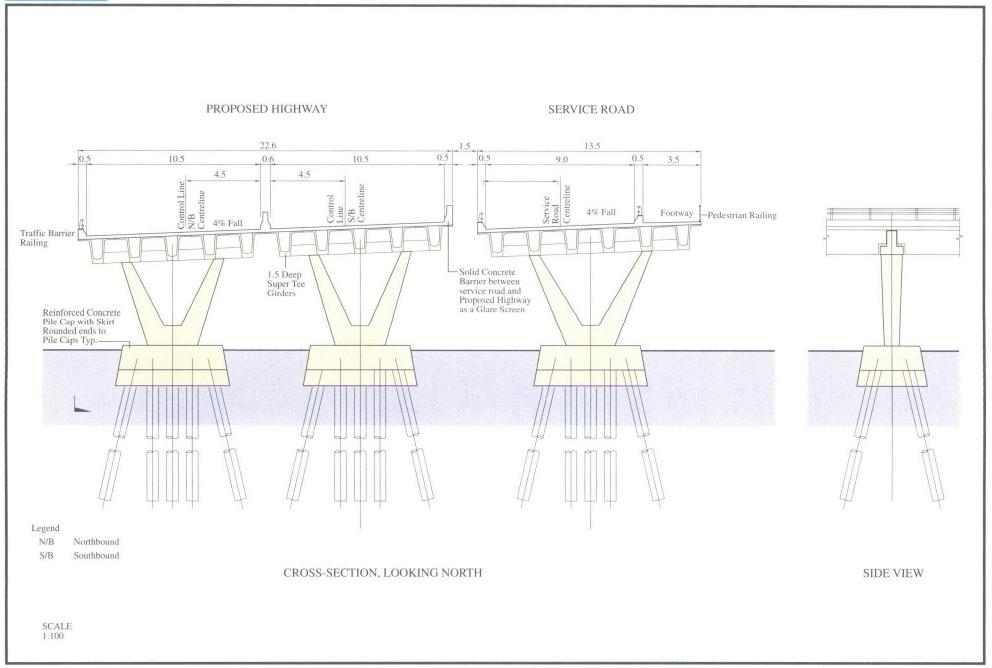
TYPICAL CROSS SECTION-PROPOSED BRIDGE OVER BRUNSWICK RIVER
